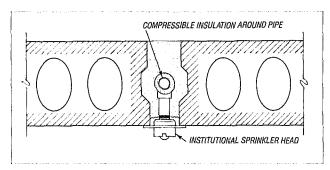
A fire protection sprinkler supply pipe embedded in the grout joint between precast concrete floor planks.
